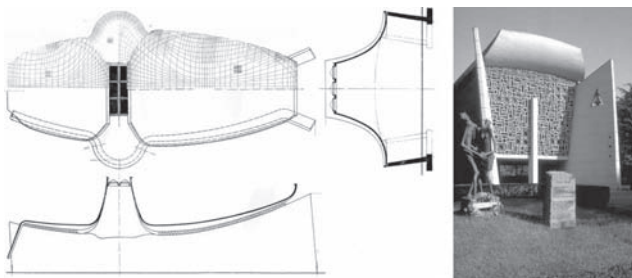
Plan and sections of the church (main reinforcement shown in the upper half of the plan) and the main facade
